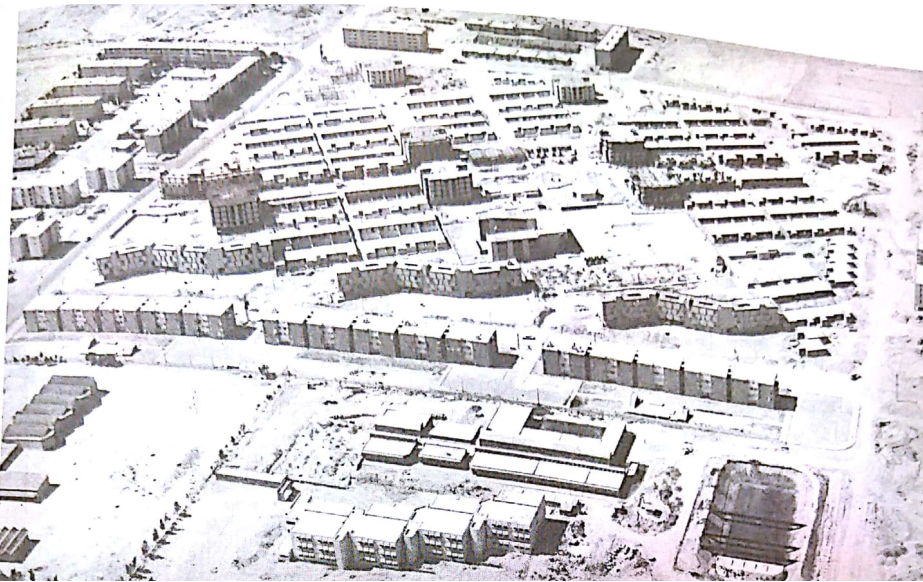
Aerial view of the Exemplar neighborhood. In: "Israel Builds 1973" magazine, the planning, and engineering department, Ministry of Construction and Housing, Jerusalem, 1973. p. 201
